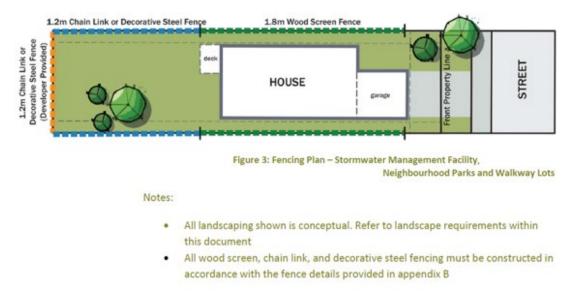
Fencing Plan - Stormwater Management Facility, Neighborhood Parks, and Walkway Lots
